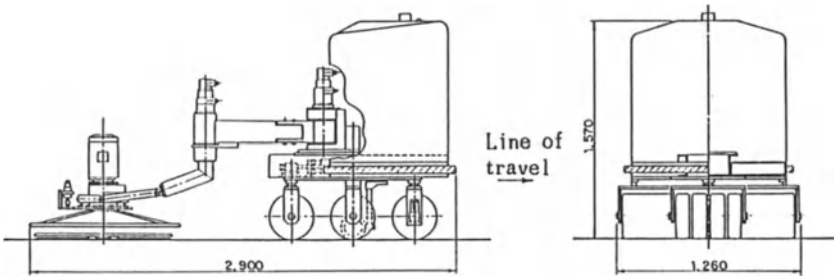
Outer dimensions of the concrete slab-finishing robot (Kajima)
